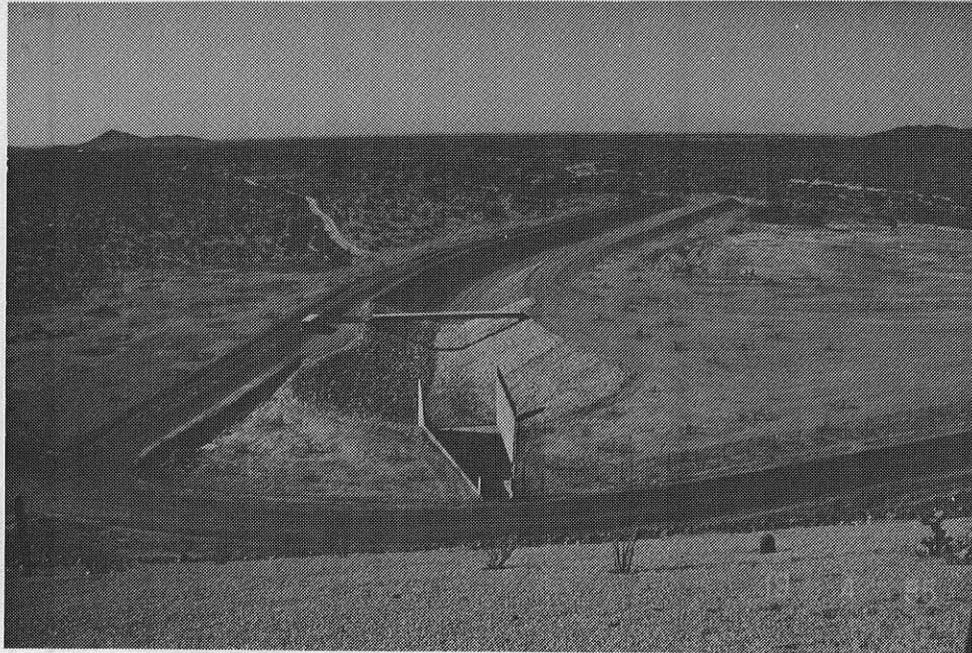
Looking downstream at main access road, energy dissipator, gaging station bridge, and outlet channel from crest of dam. April 1985
